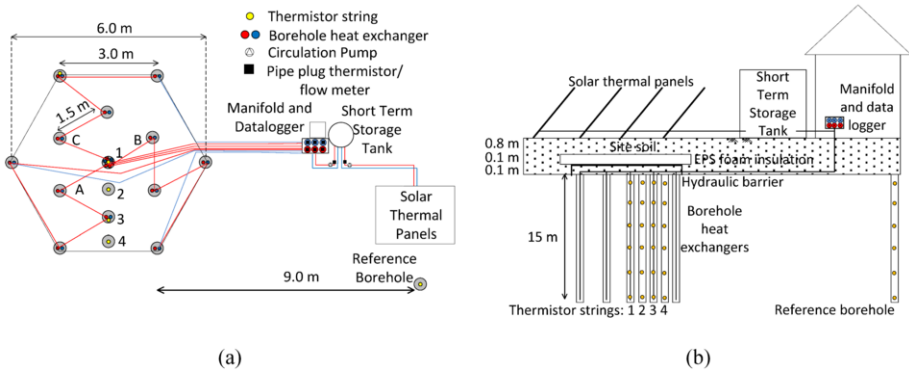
UCSB BTES system: (a) Plan view, (b) Elevation view of BTES system.
